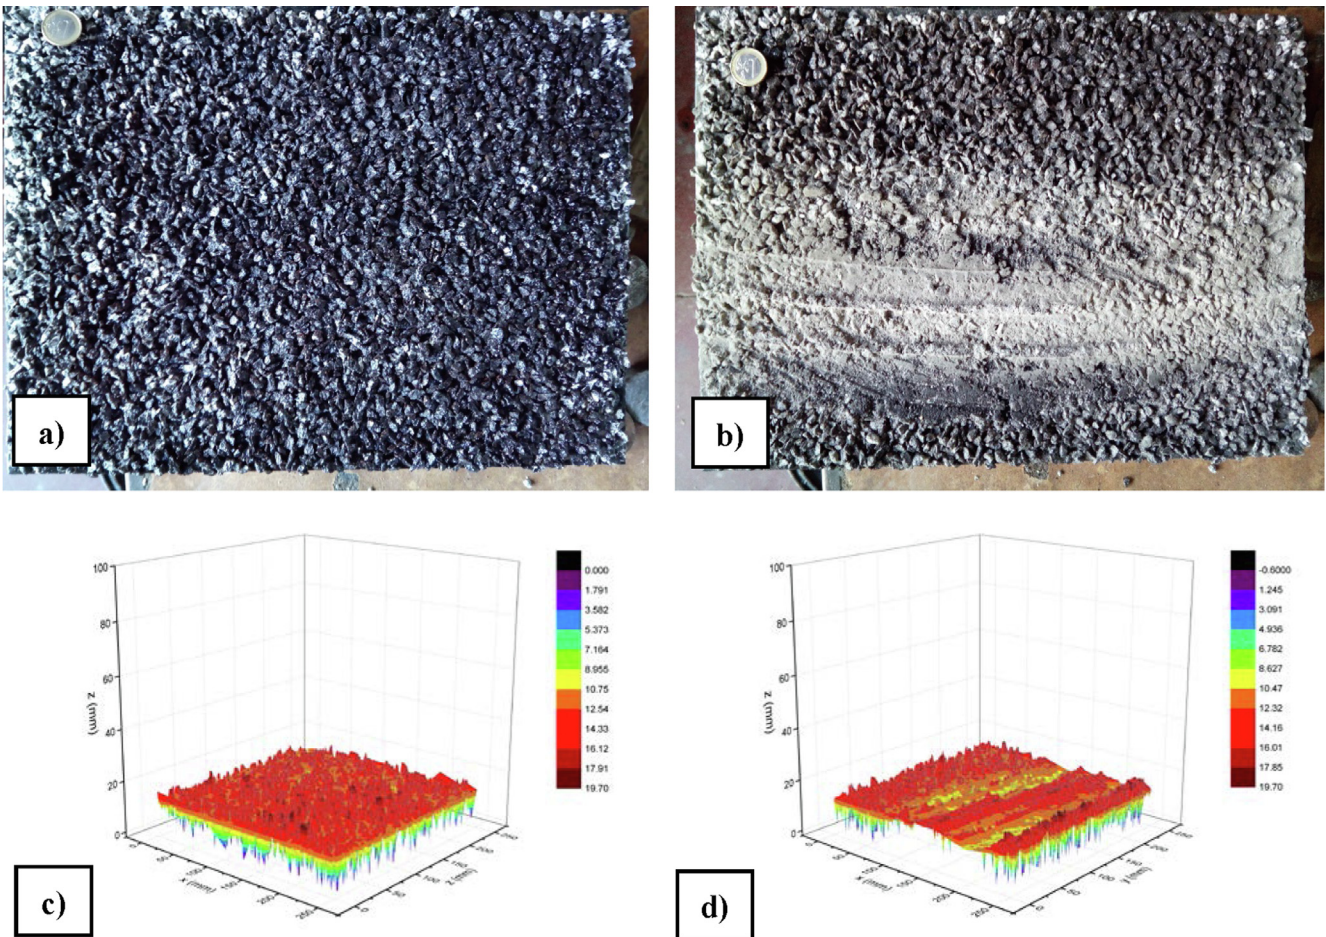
Surface dressing: a) before wearing; b) after wearing. Macrotexture by laser table acquisition: c) before wearing; d) after wearing.
